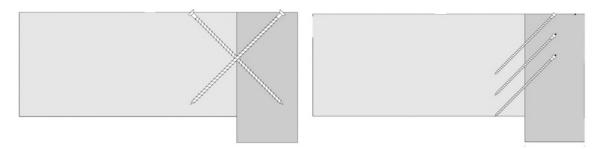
Screw fixed be am to beam connection. (Image credit: Spax)
